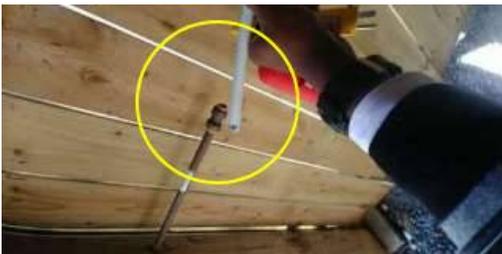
Damage plumbing pipe to backyard hose bib
